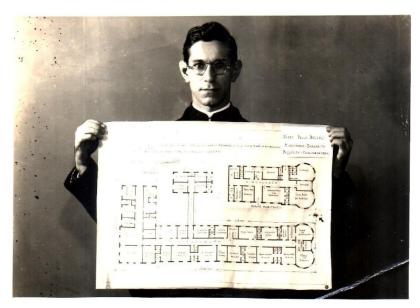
Photo of Father Paulo Belloli, designer and builder of the Santa Teresinha Institute (1938). Source: Collection of the Santa Teresinha Institute (1952).
